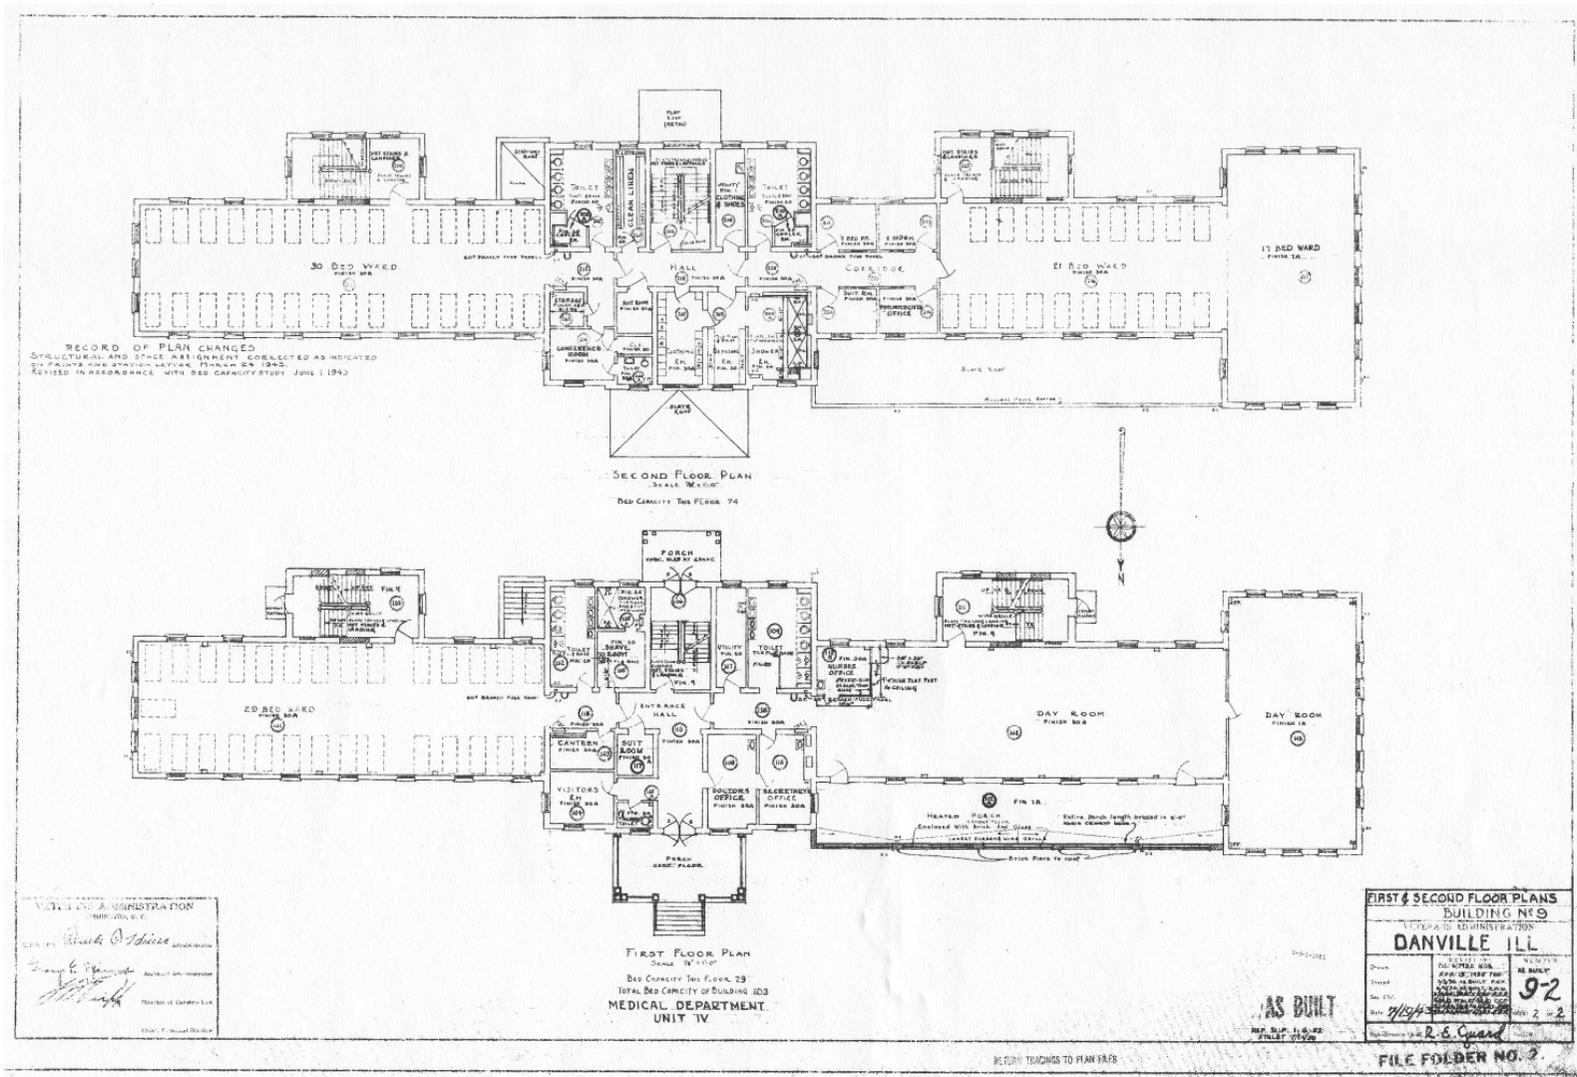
First and second floor plans of Building 9, showing modification undertaken by the VA in 1934 and later.
